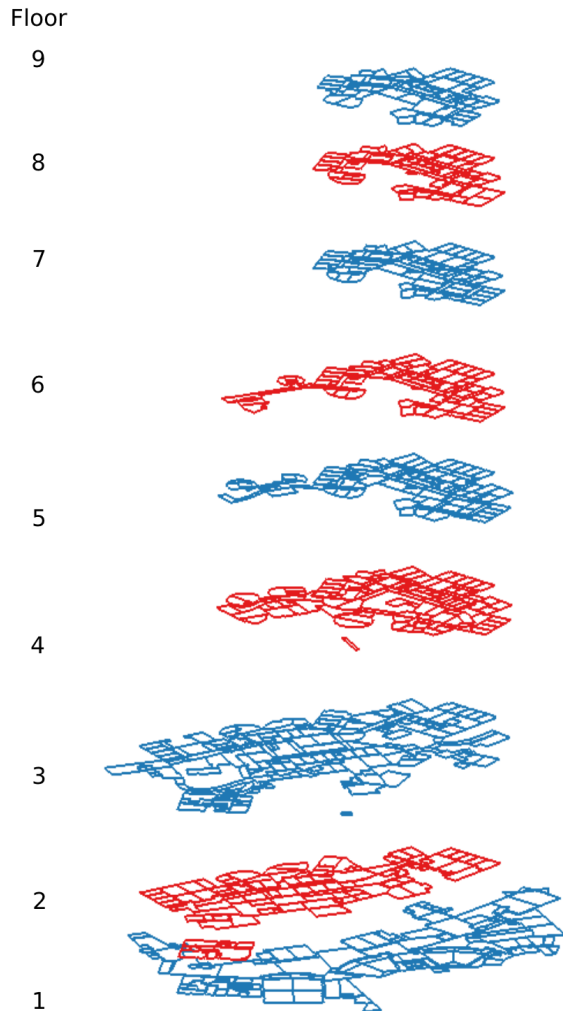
Aligned floor-plans of each of the Stata Center's floors.
